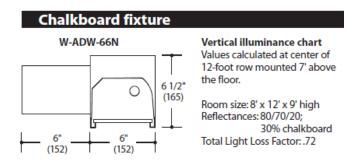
BOARD WASH LUMINAIRE DETAIL
